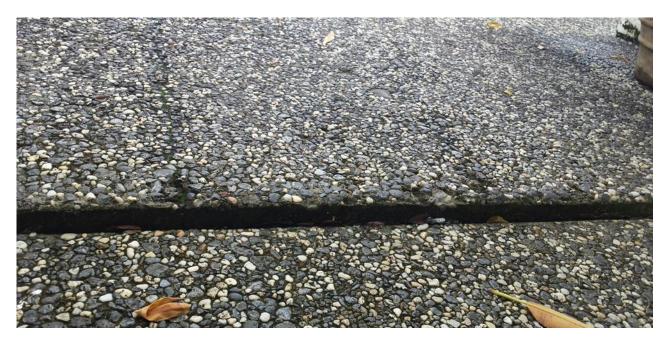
Lifted concrete driveway slab abutting the garage floor slab as photographed on 6 April 2017. At the time the step at the joint was measured at 25mm high.
